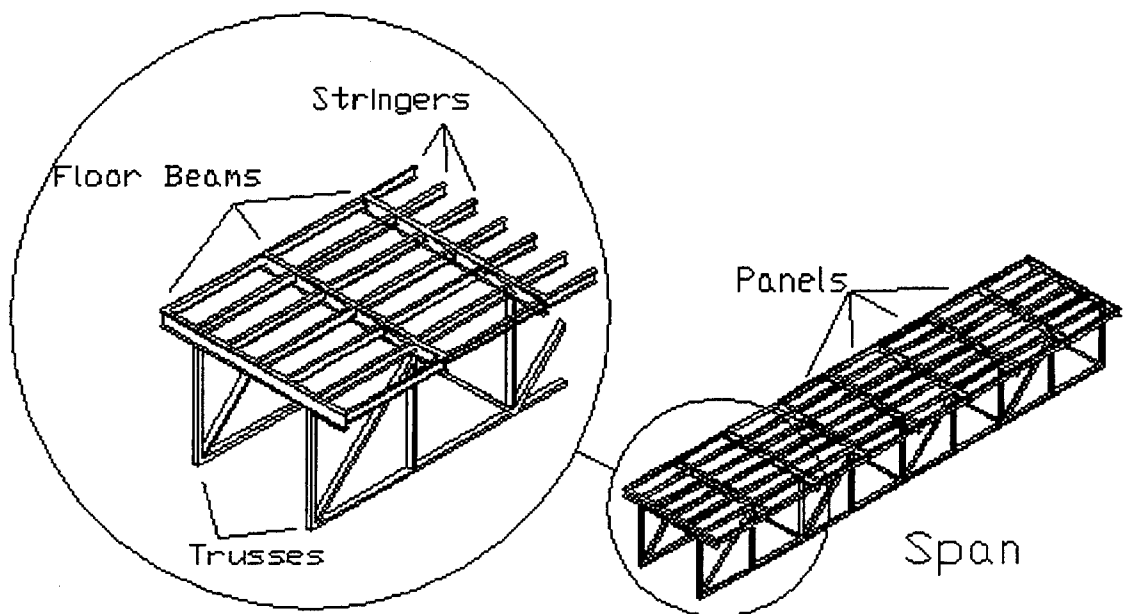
Diagram of one span of the southbound structure of the Winchester Bridge without the six inch concrete deck.
